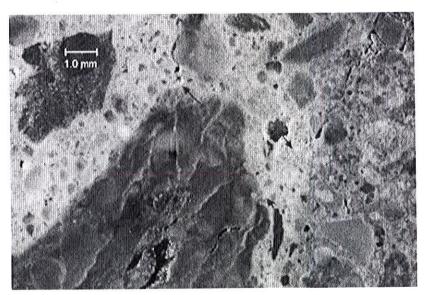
Photo 5 (see Appendix E page 177) Expansive ASR cracks on Core C4B
